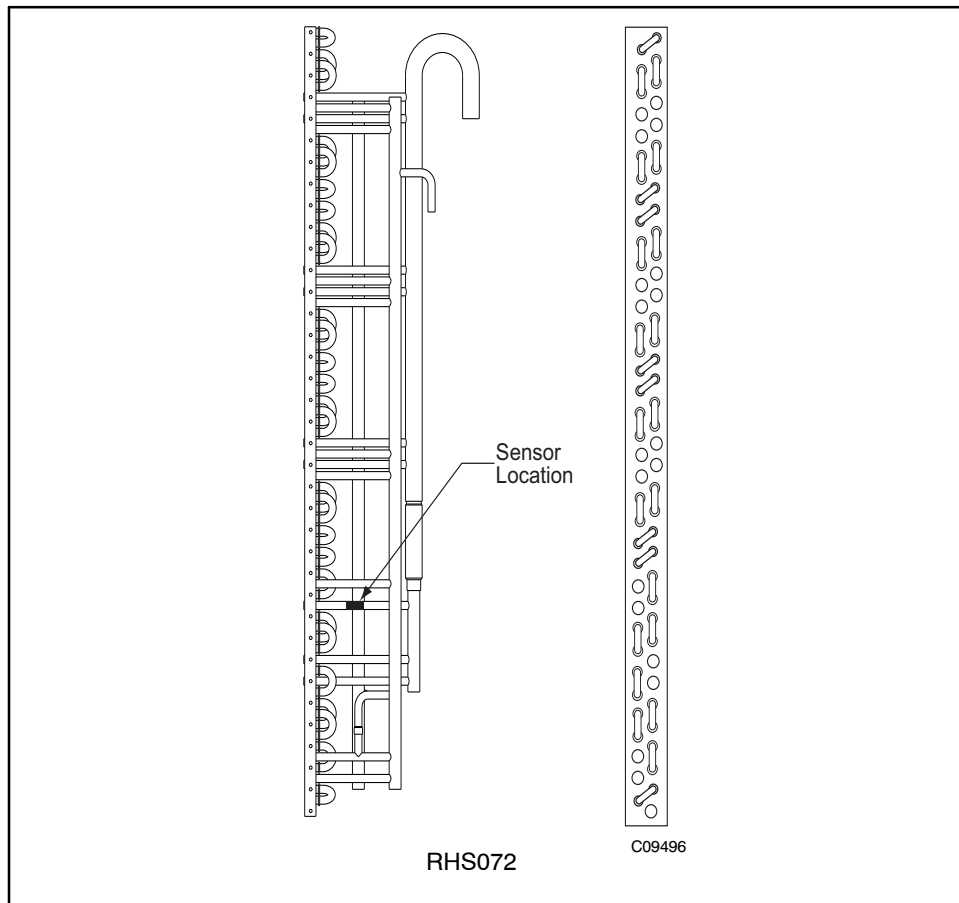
Motormaster® II Sensor Locations – 6 Ton Heat Pump Units
